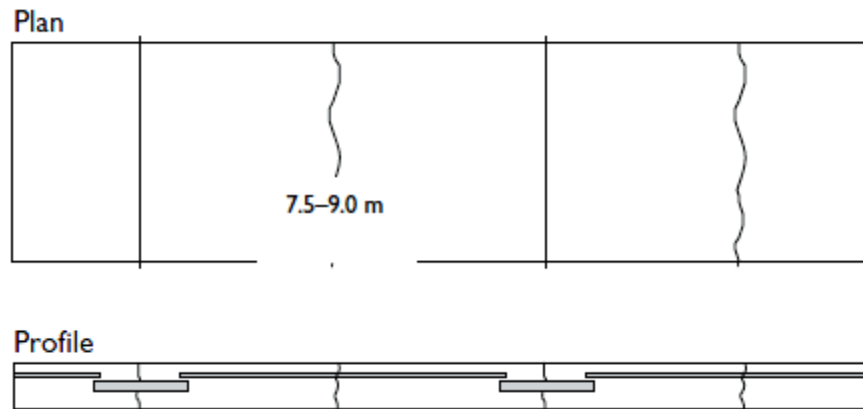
Jointed Reinforced Concrete Pavement (JRCP)
